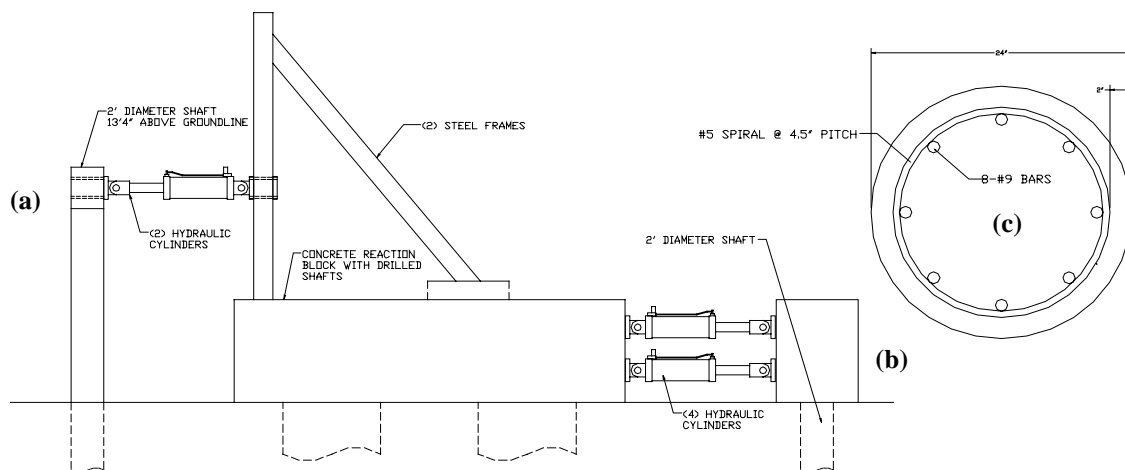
Schematic setups for (a) 2 ft flagpole and (b) fixed-head tests; (c) Shaft cross-sections
